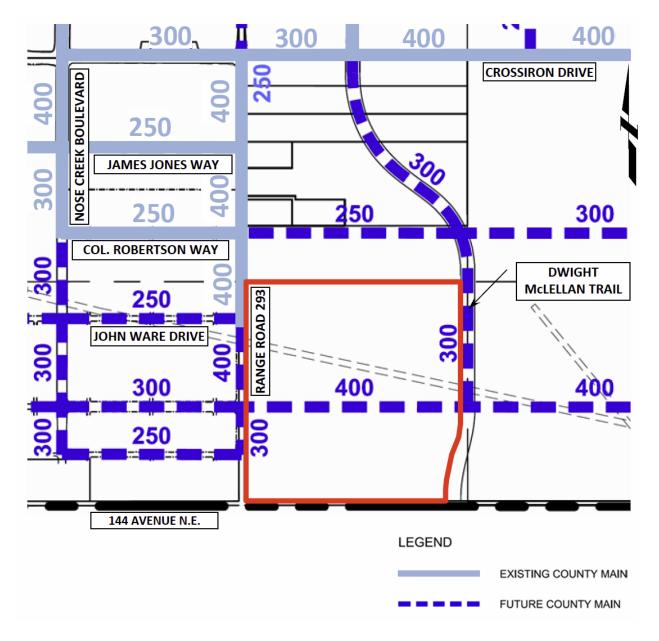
Water Mains, Balzac Master Potable Water Plan Update - (MPE Engineering Ltd. 2014, Adapted by KBES Ltd.)
